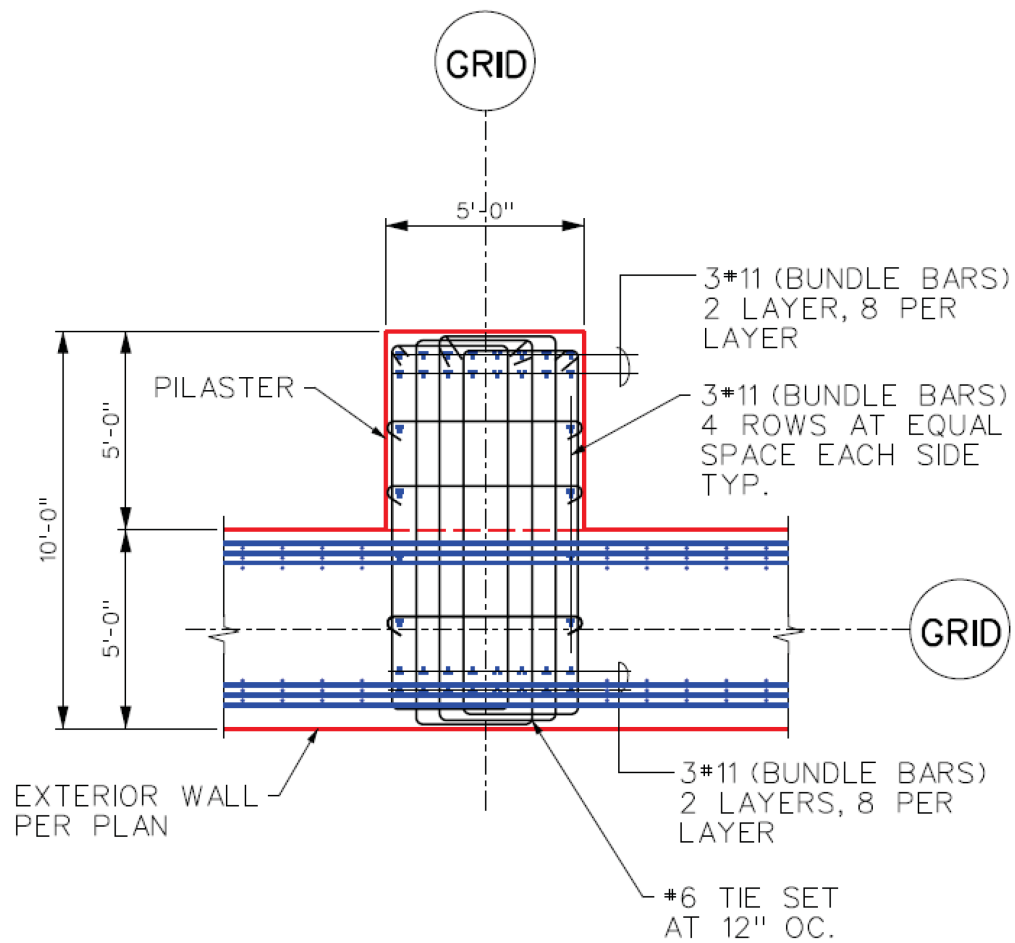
B-34: RXB Reinforcement Detail for Pilaster Type 3
